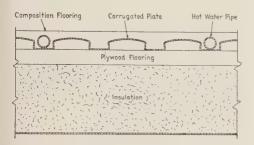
Vertical section through floor showing a method of installing hot water pipes.
